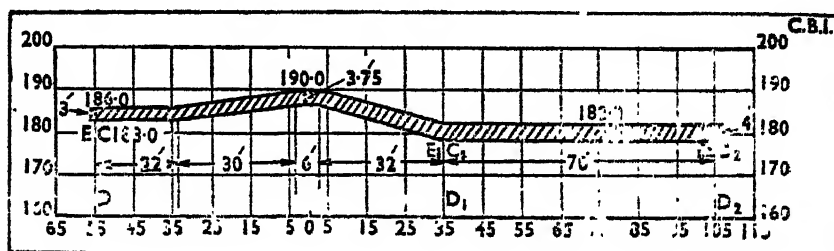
C.4 : Showing undersluice section of Mor Barrage.
